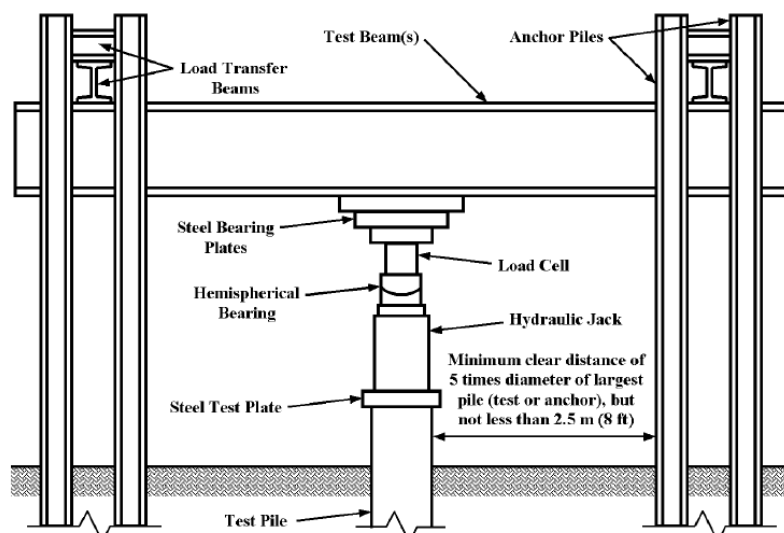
Schematic of Hydraulic Jack Acting Against Anchored Reaction Frame
